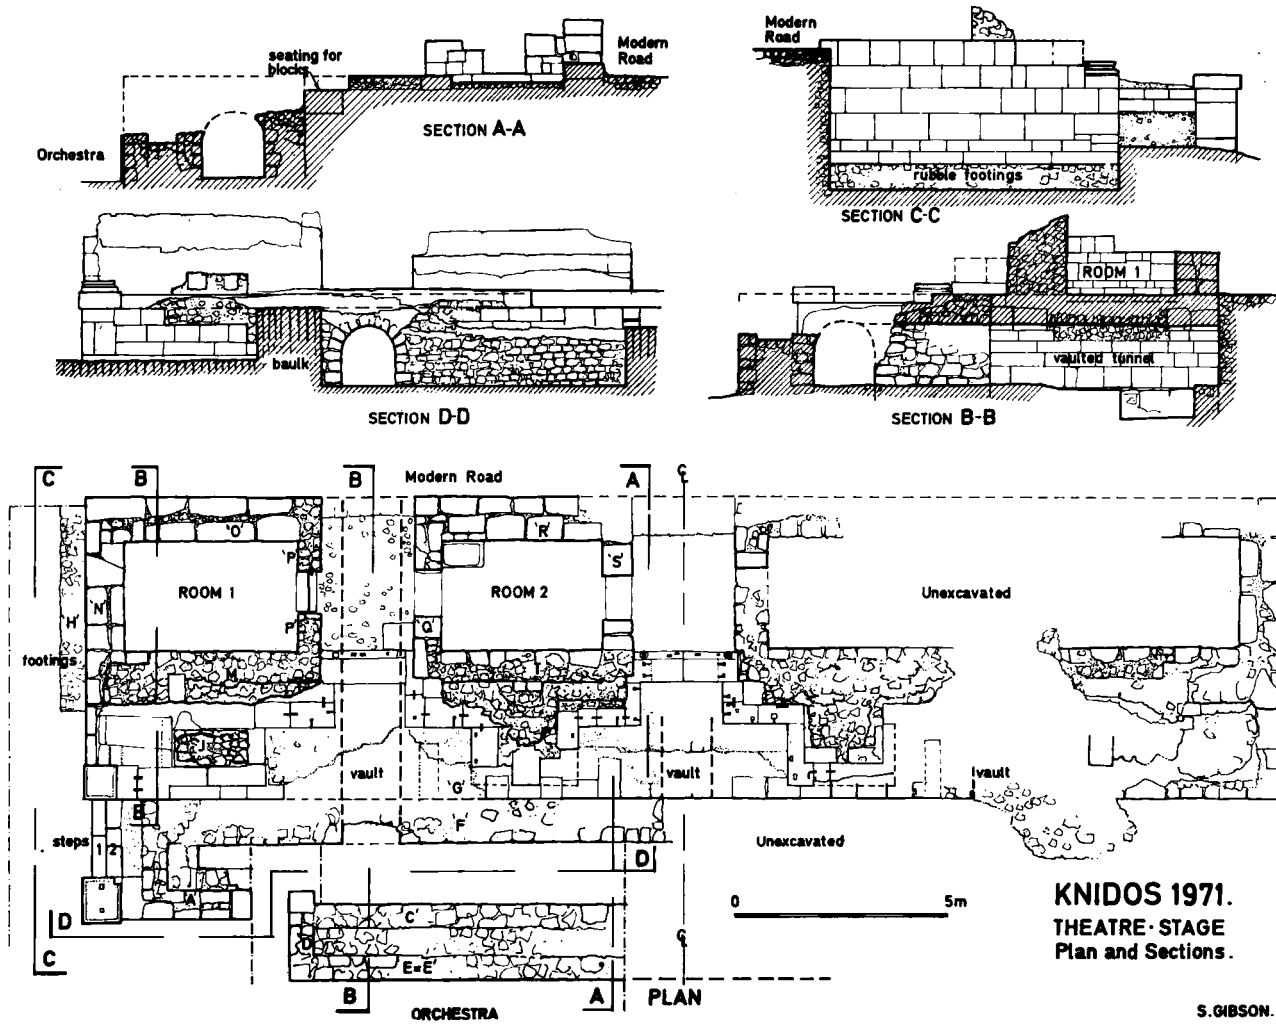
Lower Theater: 1971 Plan, sections, and elevations. Executed by Sheila Gibson
